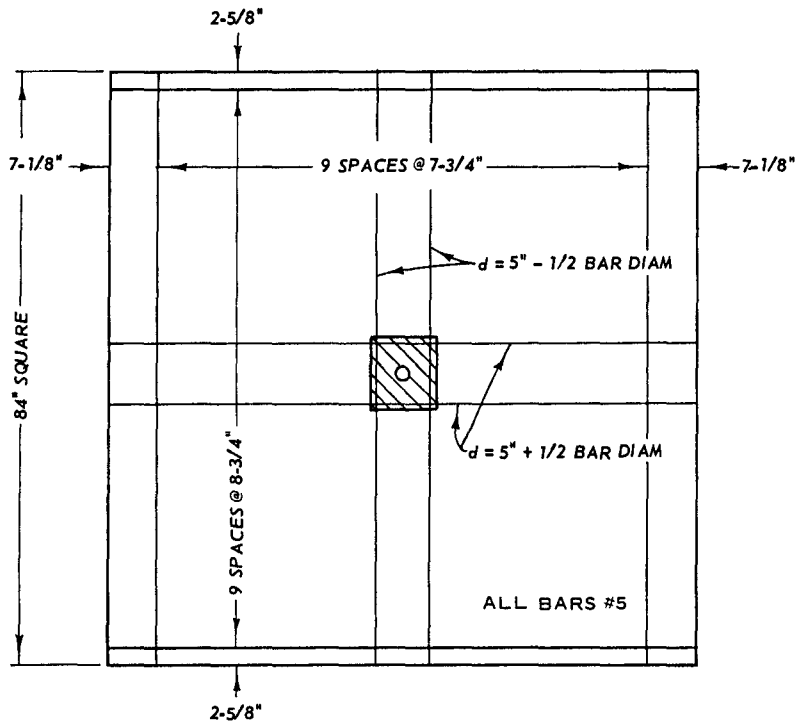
Slab reinforcement for 2075 Series specimens.
